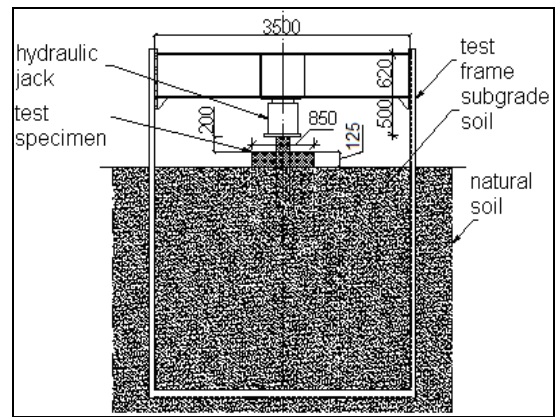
(a) Schematic Representation of the Test Set-up and Loading Arrangement
